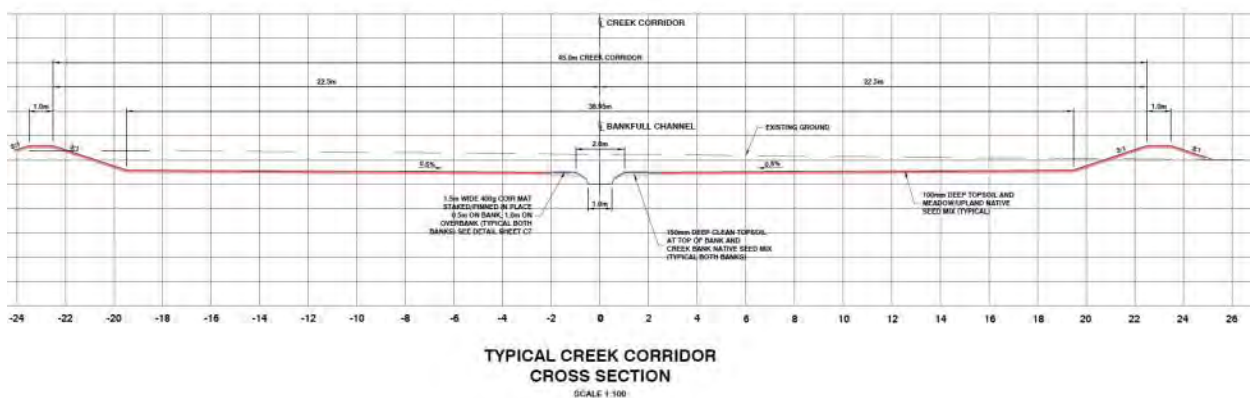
TYPICAL CREEK CORRIDOR CROSS SECTION (WOOD, DRAWING C4, 2021)
